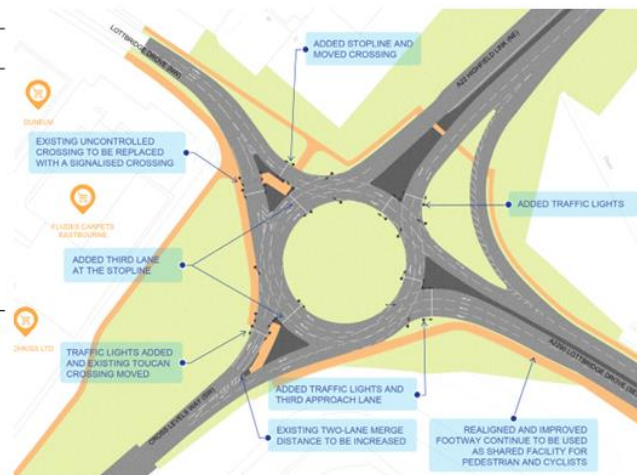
E9 Lottbridge Roundabout concept review summary
